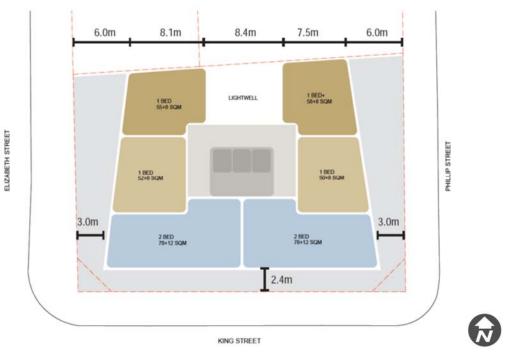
Conceptual floor layout with proposed varied setbacks above podium (approximately 549 sqm floor plate area).
